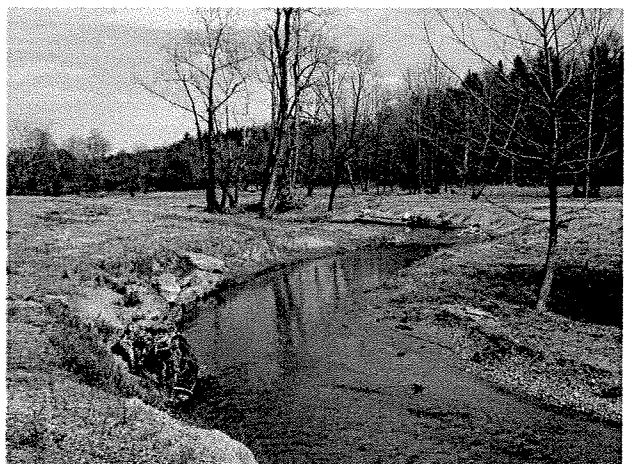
Looking upstream at rock cross vane installed at MS Station 27+33. (4/7/04)
